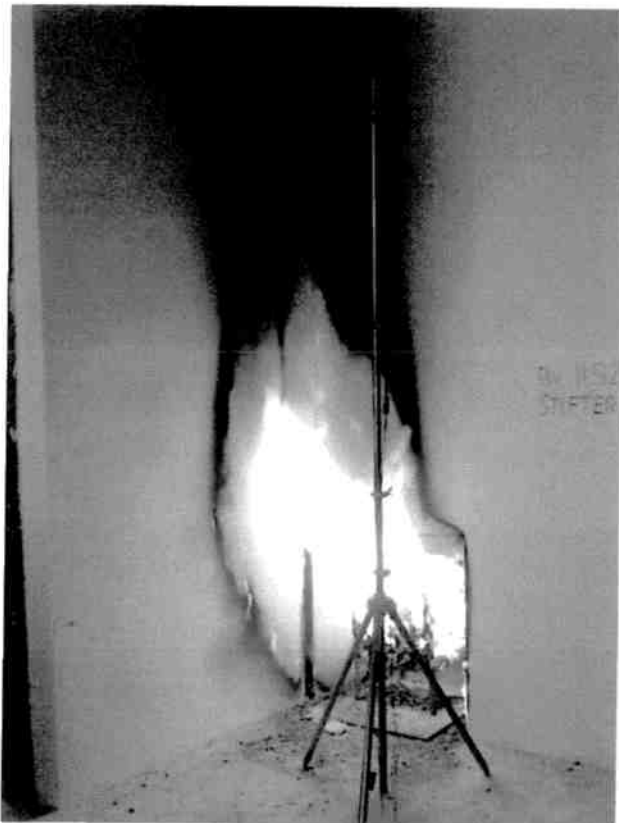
(P1060113): Test specimen during testing (9 minutes into test)
